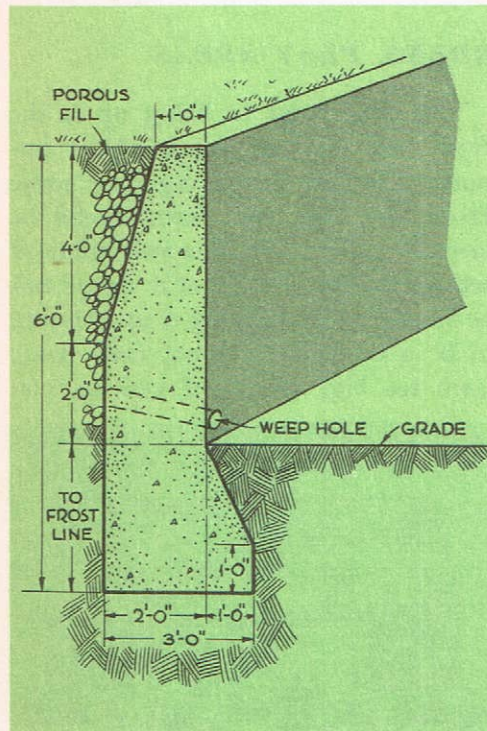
Concrete retaining wall. Note the weep holes to prevent water pressure in back of the wall from cracking the masonry.
